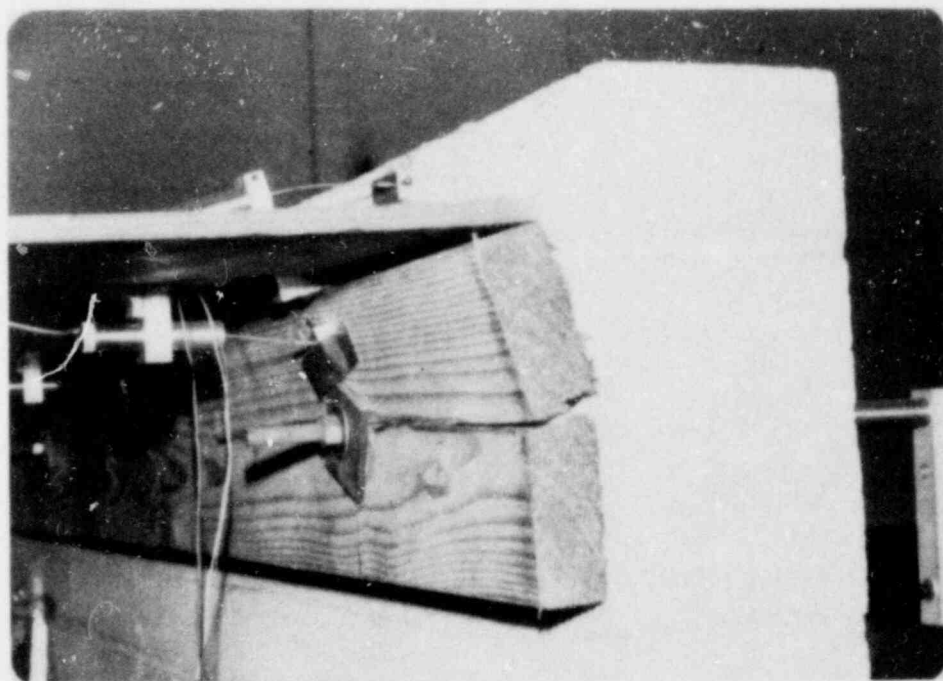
FAILURE OF LEDGER BOARD IN SPECIMEN C5-56-1/2
